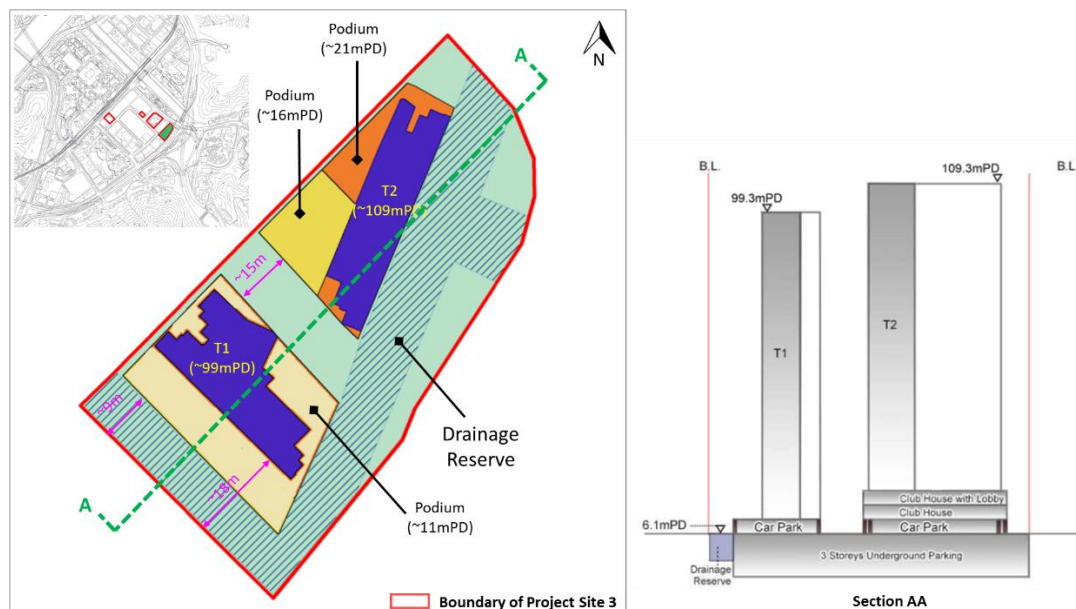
(c) Indicative Development Layout and Cut Section within Project Site 3
